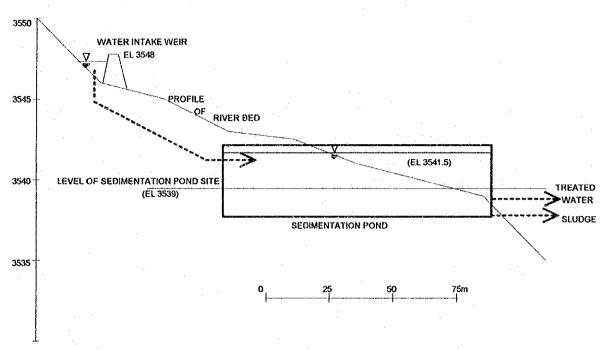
LONGITUDINAL PROFILE OF SEDIMENTATION POND
